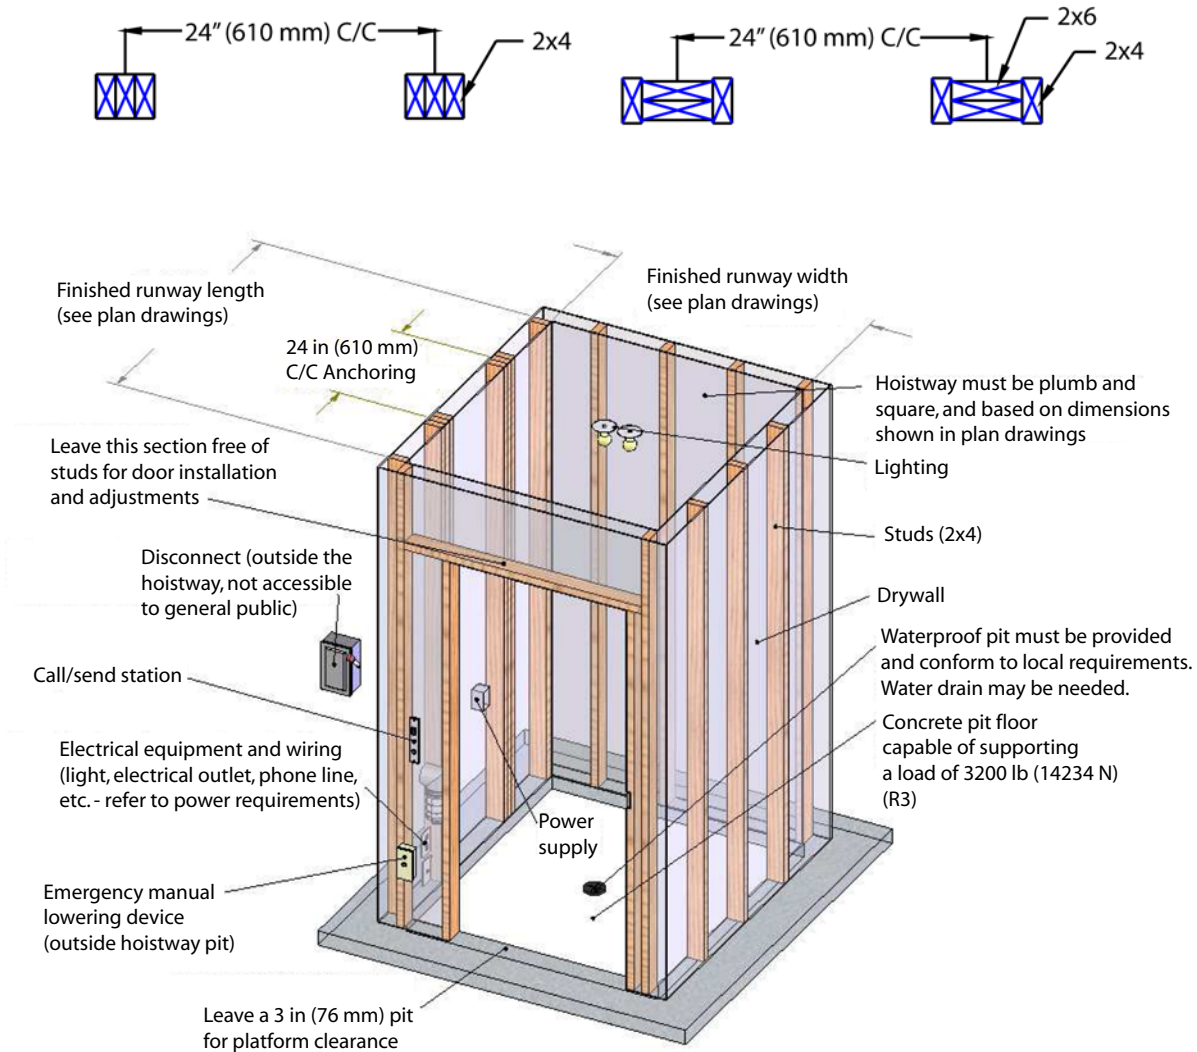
illustrates the recommended steps for constructing a wooden hoistway.
